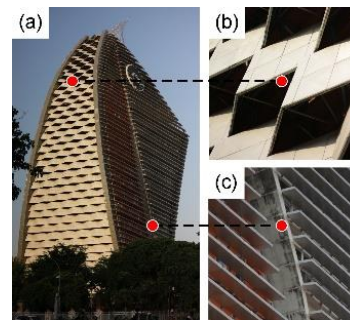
Building detail: (a) Phinisi tower; (b) Folding material (ACP); (c) Sun shading
